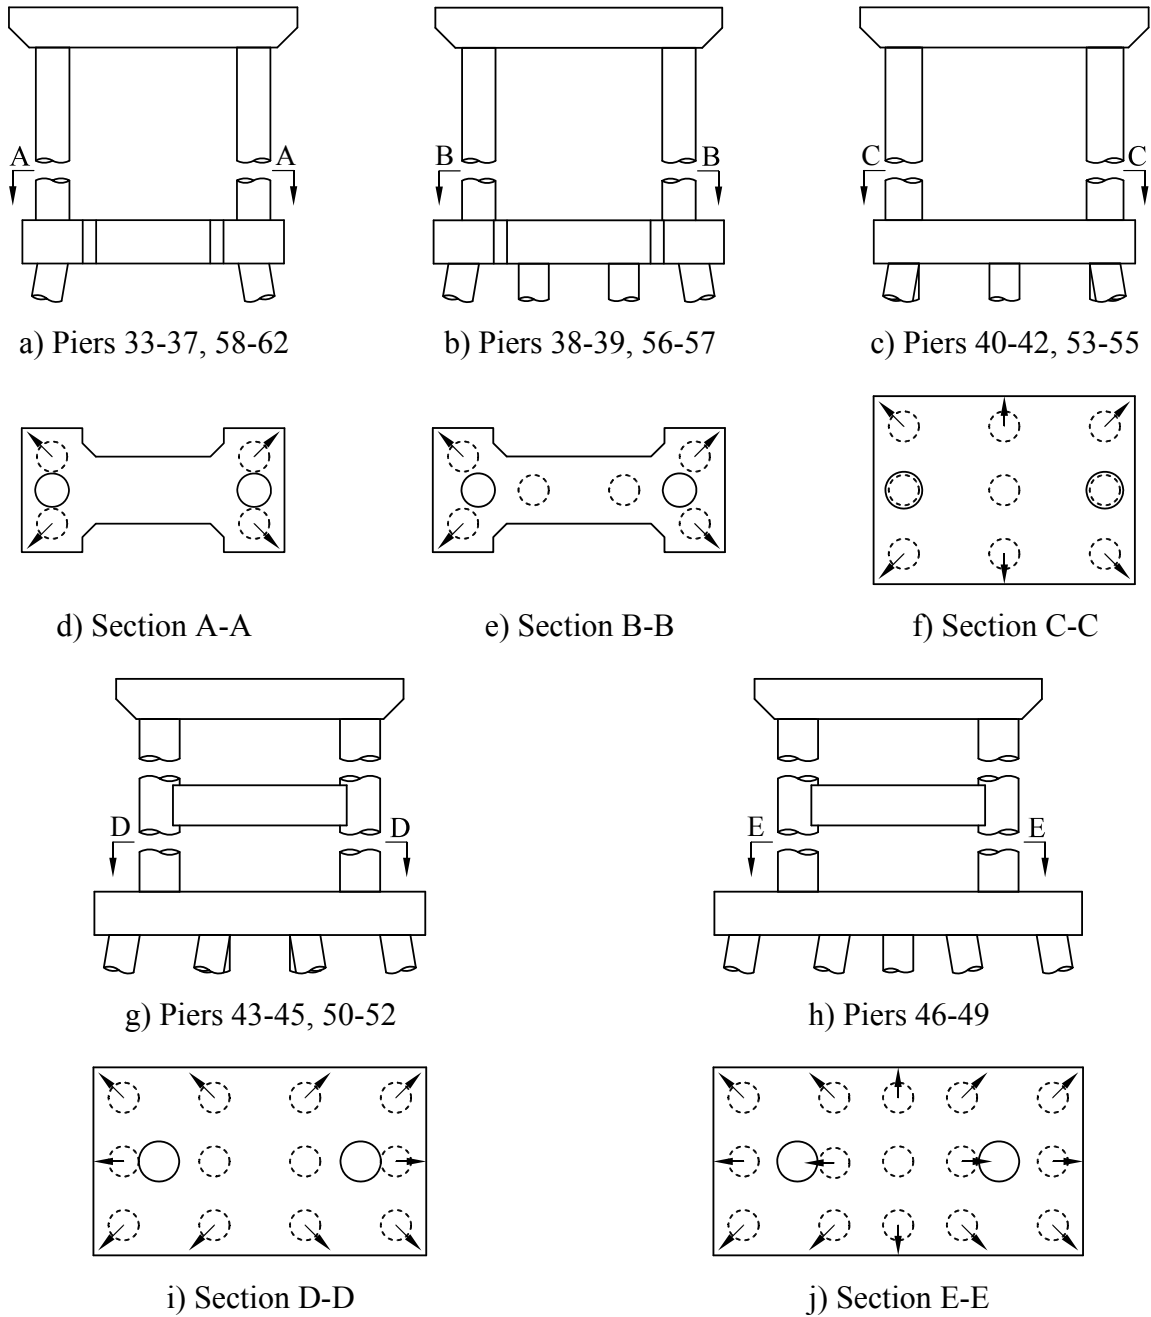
Pier and foundation configurations for SR-300 Bridge
